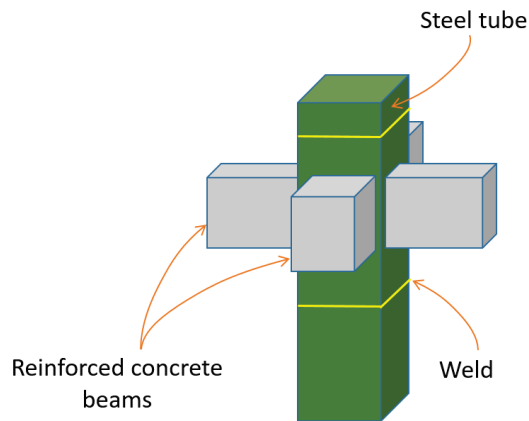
Detailed joint system configuration for a reinforced concrete-filled steel tube (RCFST) column connected to reinforced concrete beams, highlighting interface characteristics (adapted from Gan et al. (2019) [26]).
